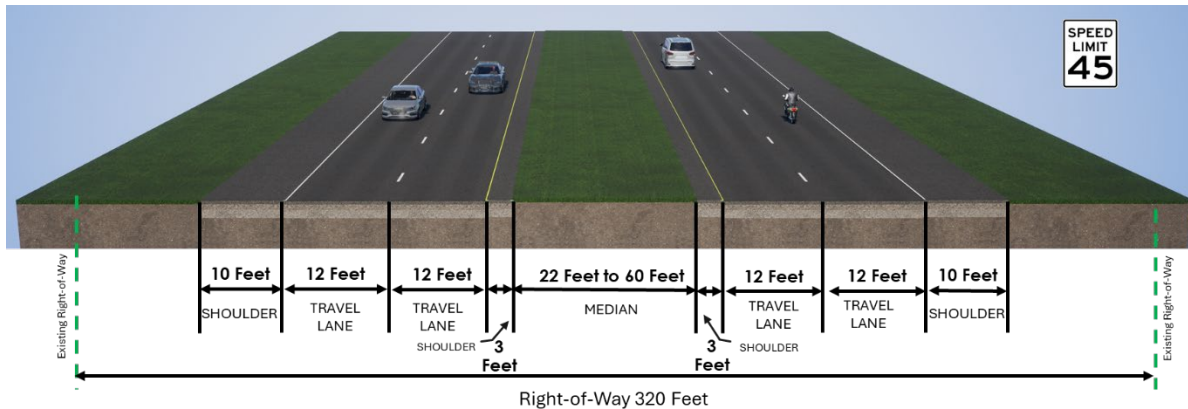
Existing Roadway – US 301 West of 9th Street East
